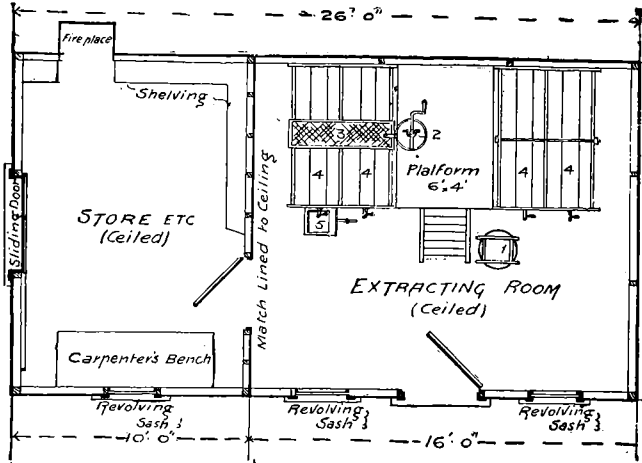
Ground plan of first apiary building at Ruakura Government Farm.
